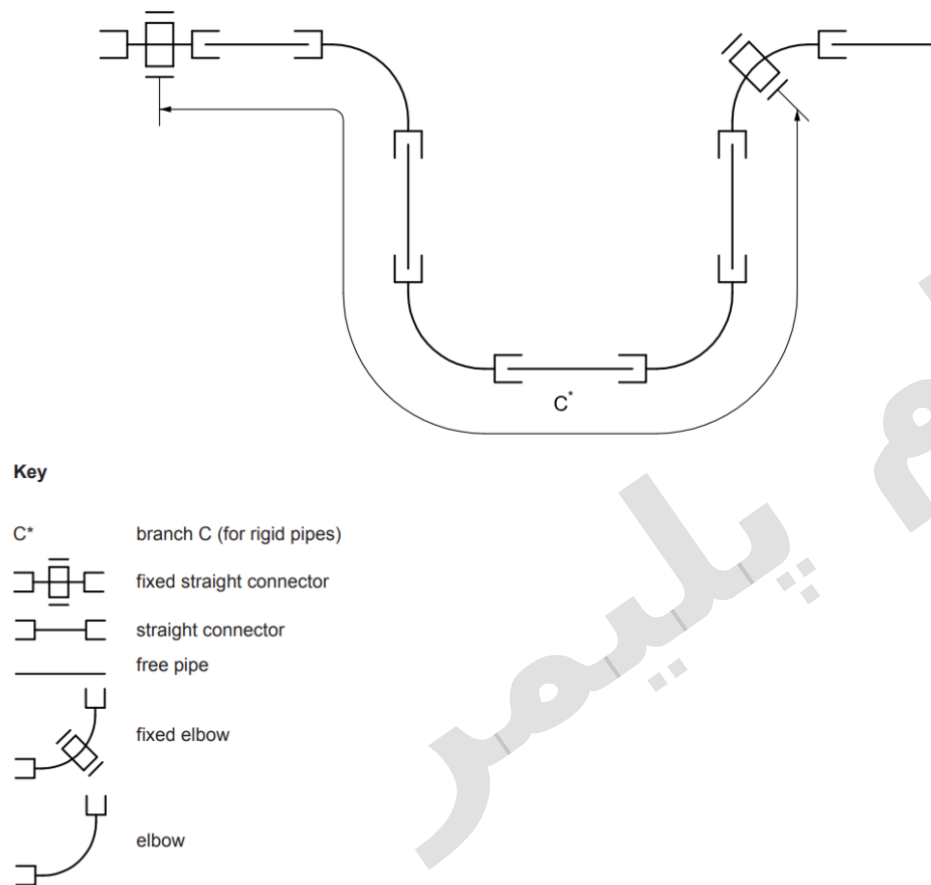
Alternative test arrangement of branch C for rigid pipes
